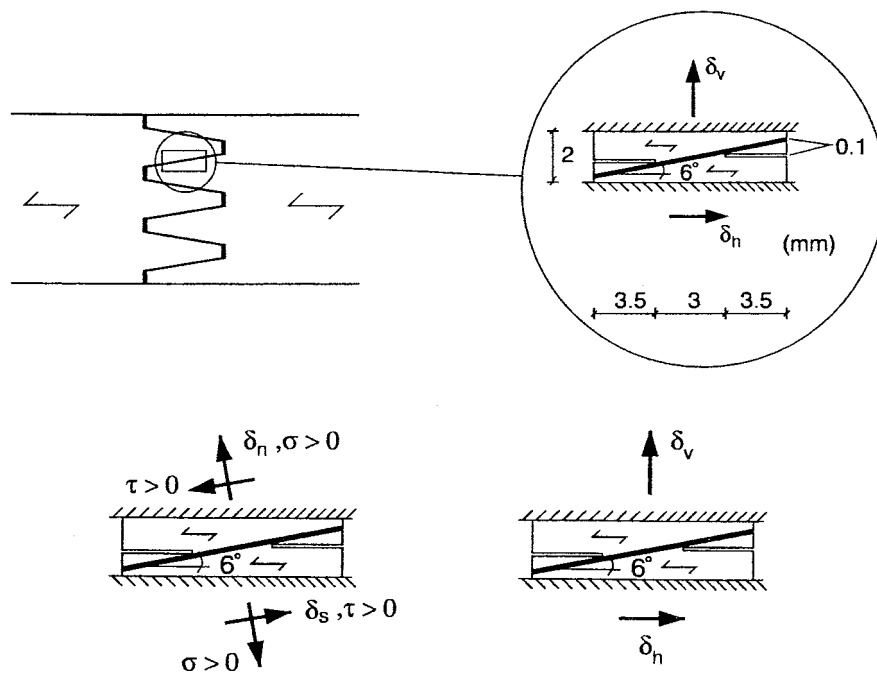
Finger joint bond line specimen and notation for stresses and deformations.
